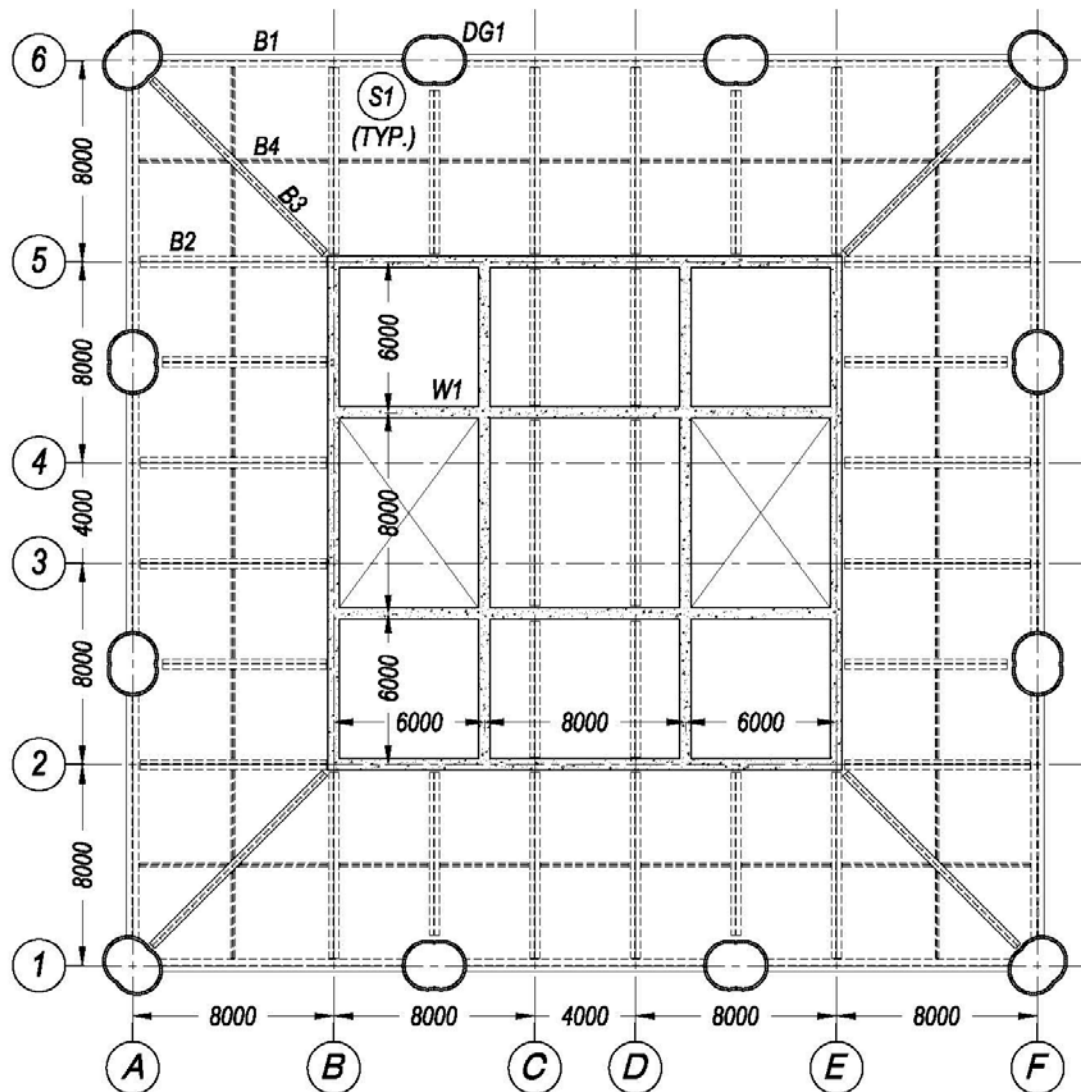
Prototype Building Drawing - Plan View (all dimensions in mm).
